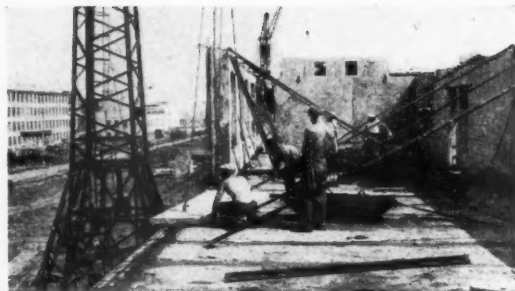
Precast concrete panel wall construction at New Cheremushki. Men placing a crane-handled balcony slab in position. Note absence of guard-rails. The women at the back are grouting up wall panels.
